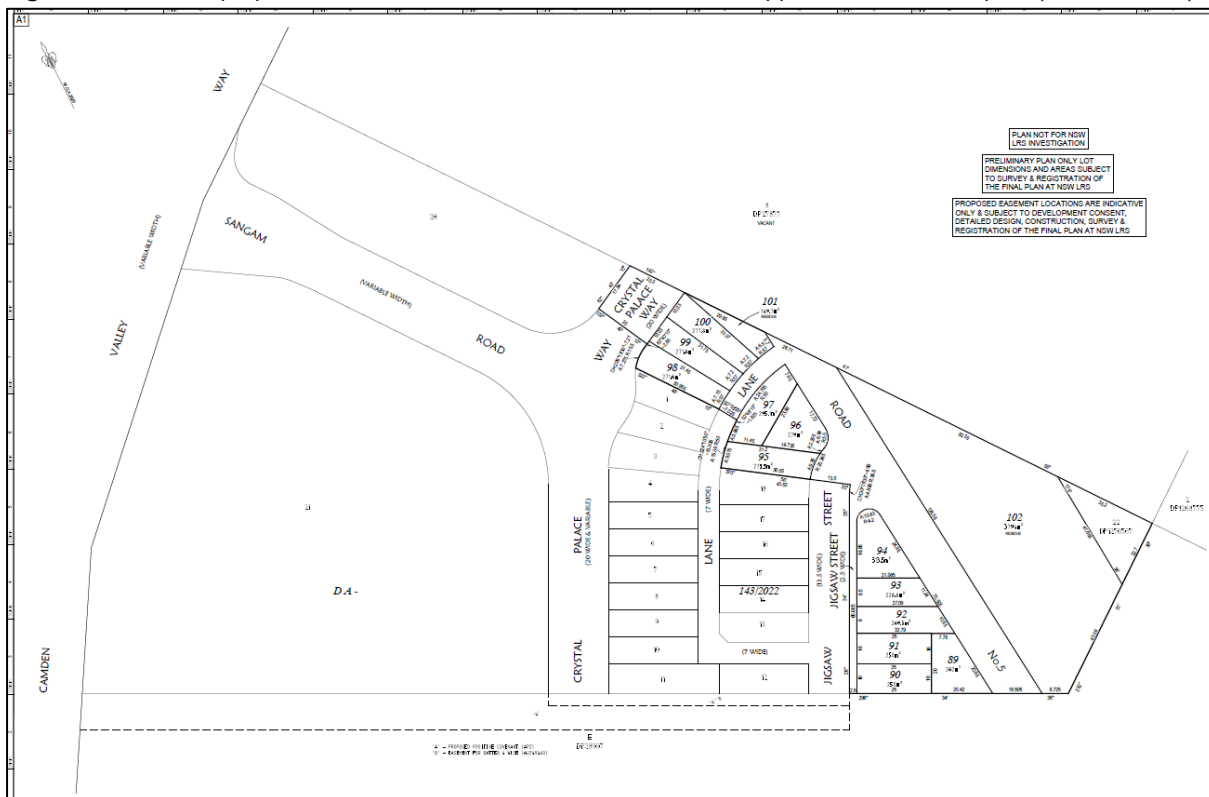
Extract of proposed subdivision under DA-179/2025 (subject application).
